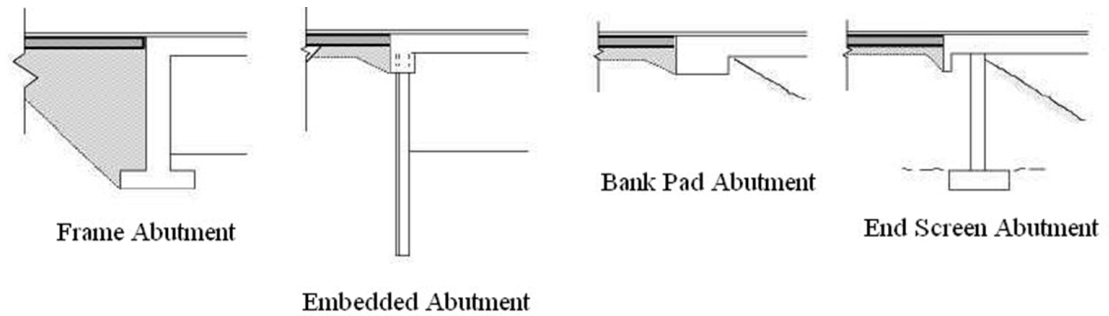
Four types of integral bridge abutments (Highway Agency, 2003)
